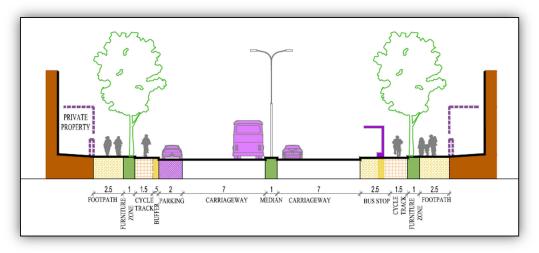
Street design proposal for 30 m wide road with footpath, cycle track, parking, bus stopand traffic carriageway
